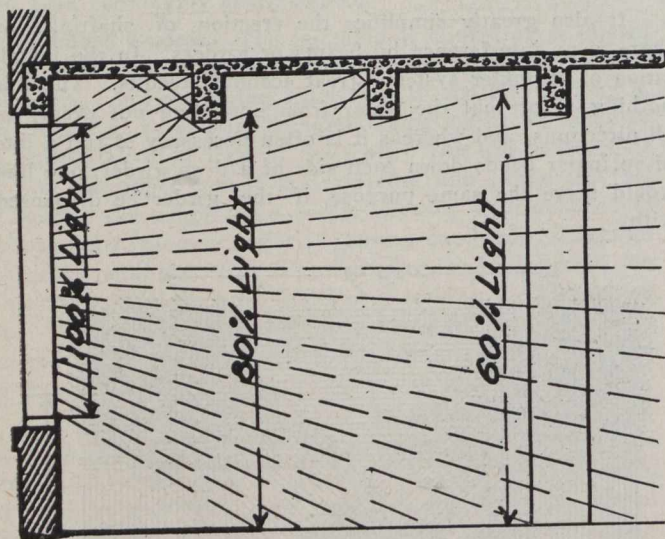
Beam and Girder System. Light Rays Reflected by Ceiling are Pocketed by Beams.
